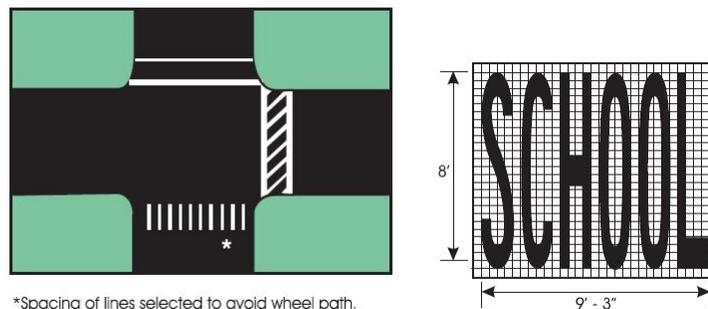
Typical Crosswalks and School Marking Dimensions for One Lane Approach
